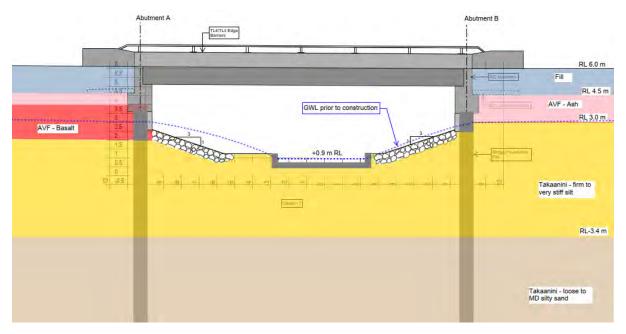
Proposed bridge upgrade work and groundwater profile adopted for assessment.
